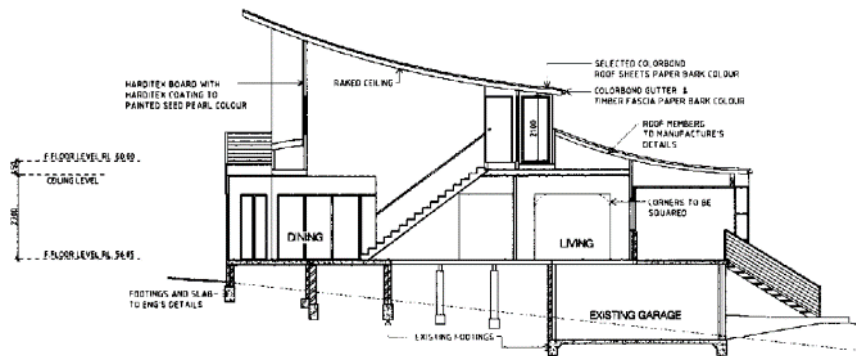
Extract from 14 Hillcrest Ave 2003 DA – Ground floor FFL is 56.85
